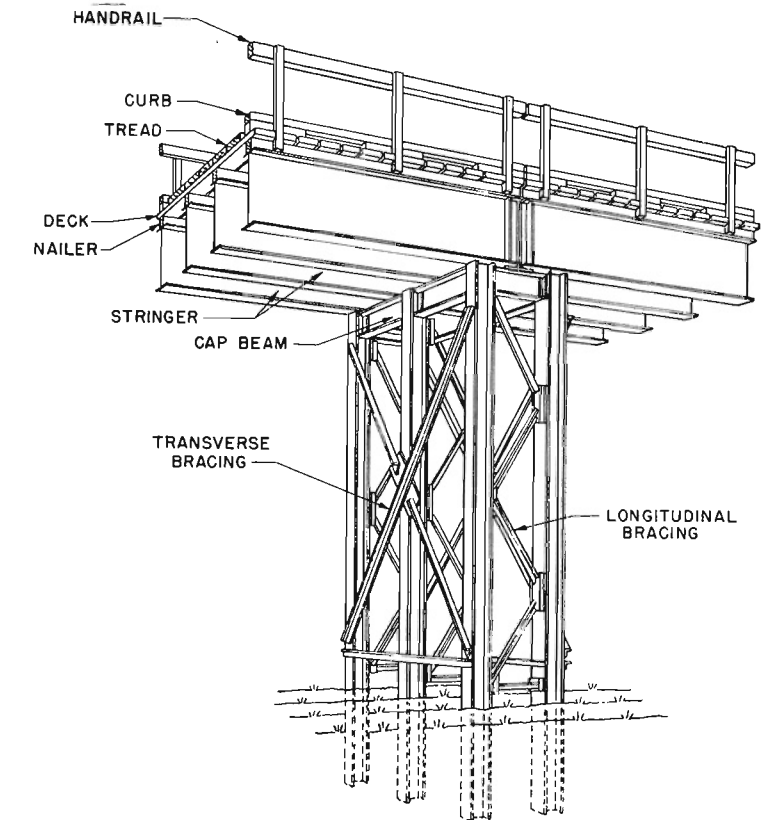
Highway bridge, class 50, single-lane, steel stringers on steel pile pier.
